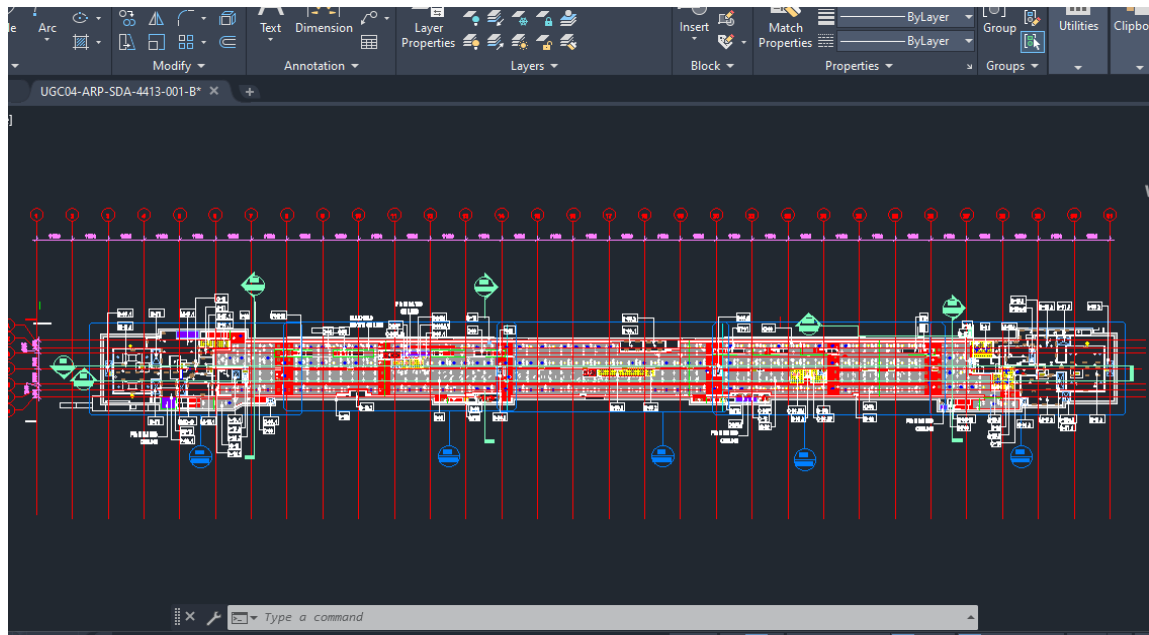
AutoCAD layout (Floor Plan) of a typical Underground Metro Station Concourse
